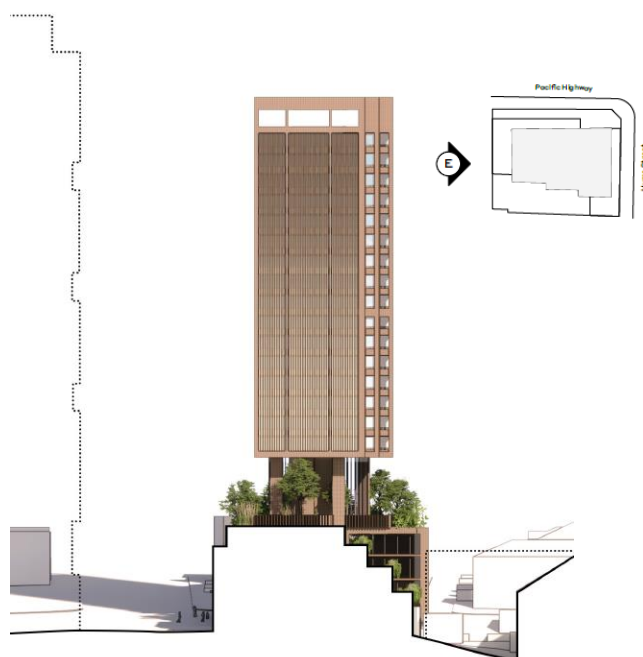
Proposed east elevation (from Pacific Highway) (source: Wood Bagot)
